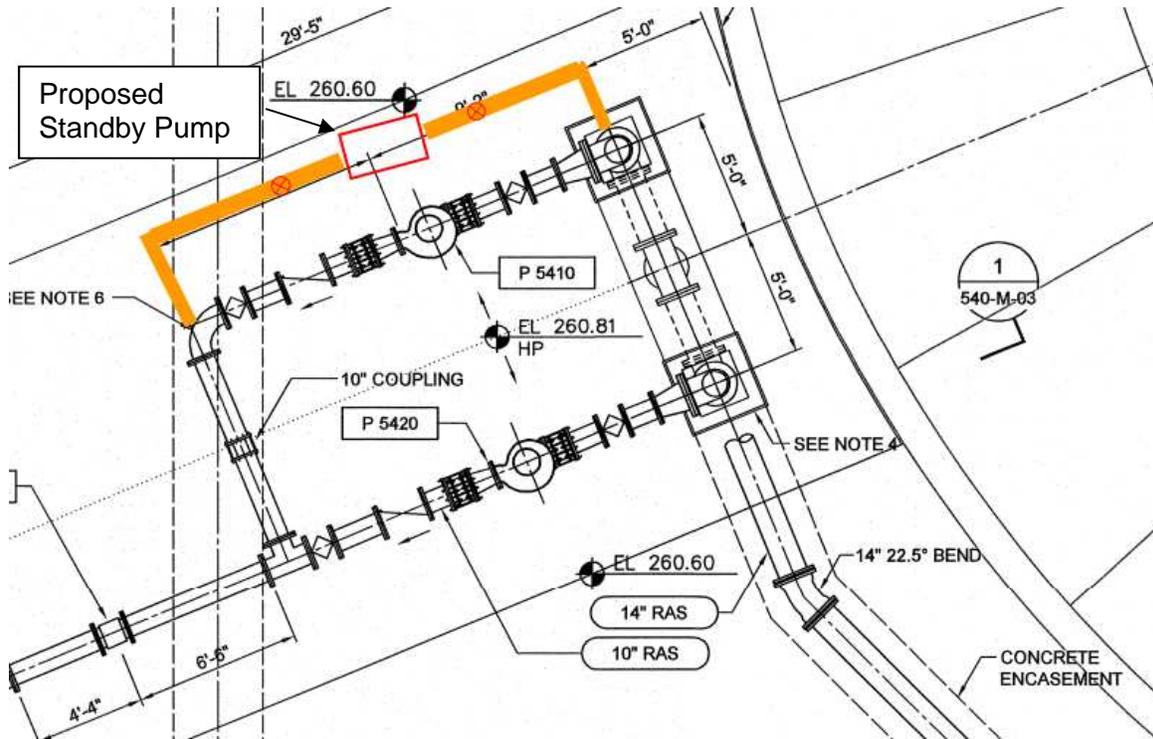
Proposed Standby RAS Pump and Piping for Clarifier 4
